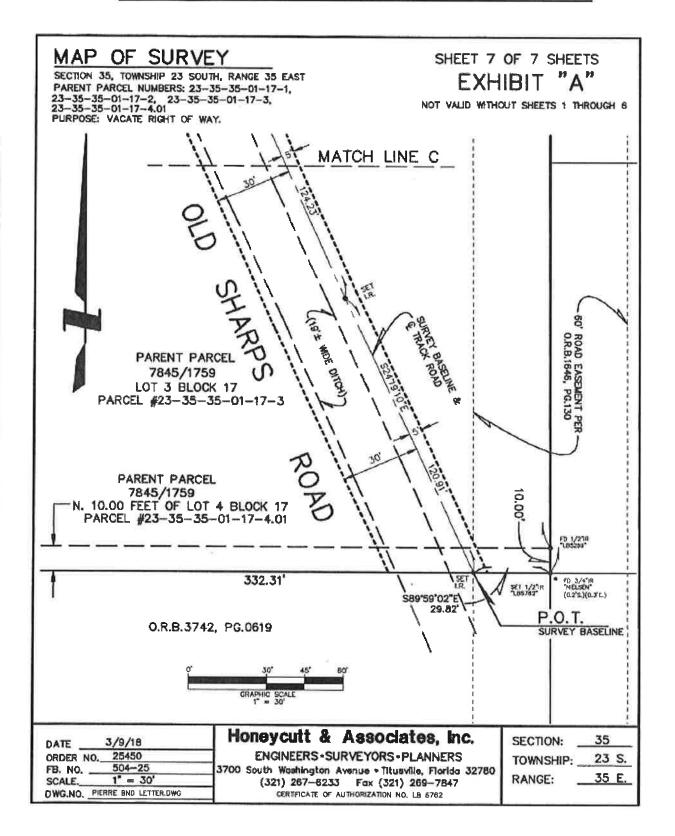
Copy of sketch sheet 7 of 7 of right-of-way Old Sharpes Road.
